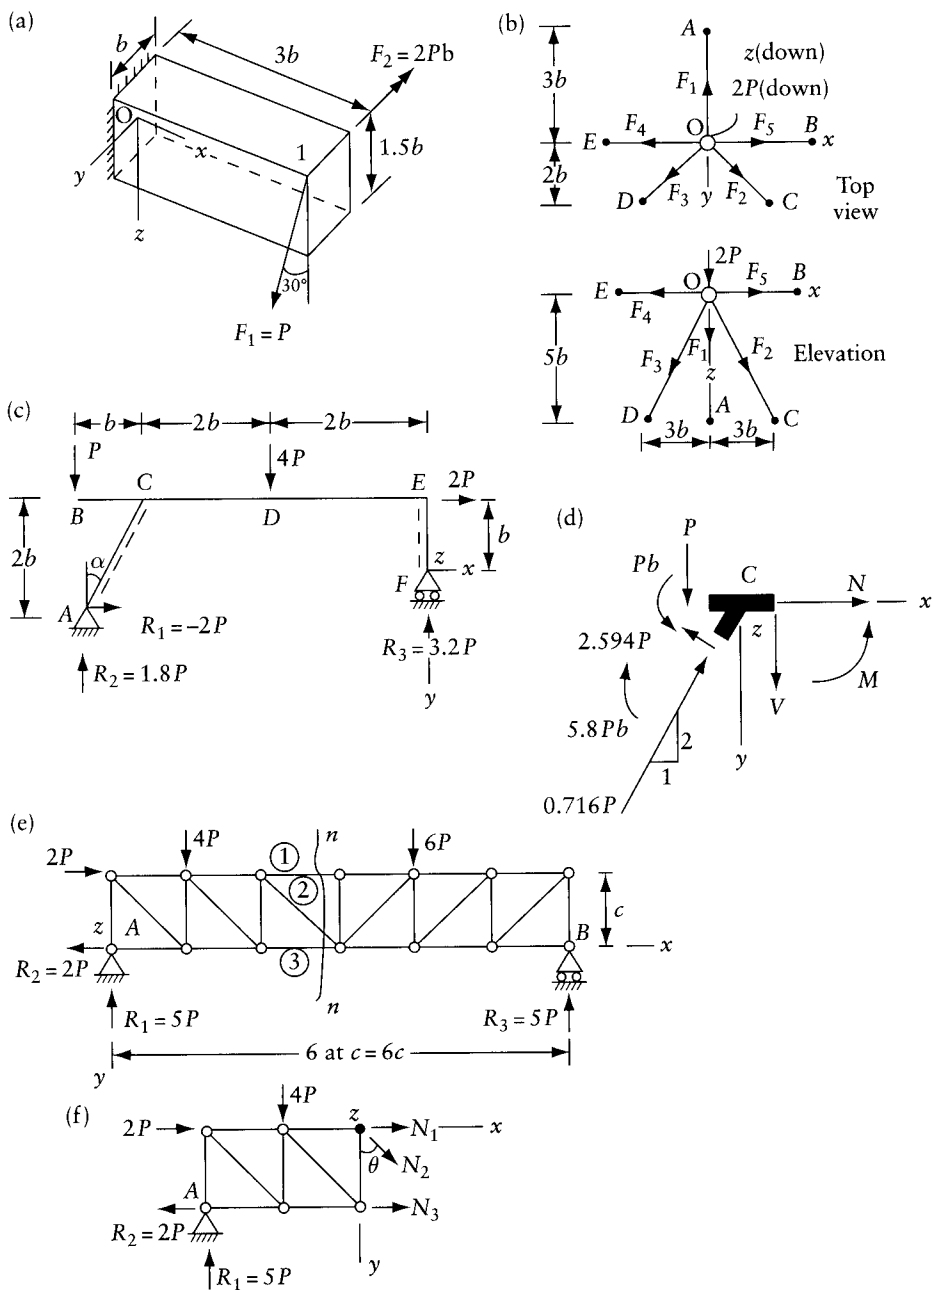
Examples 2.1 to 2.5 of uses of equilibrium equations. (a) Space cantilever. (b) Joint of space truss. (c) Plane frame. (d) Joint of a plane frame. (e) Plane truss. (f) Part of plane truss.
